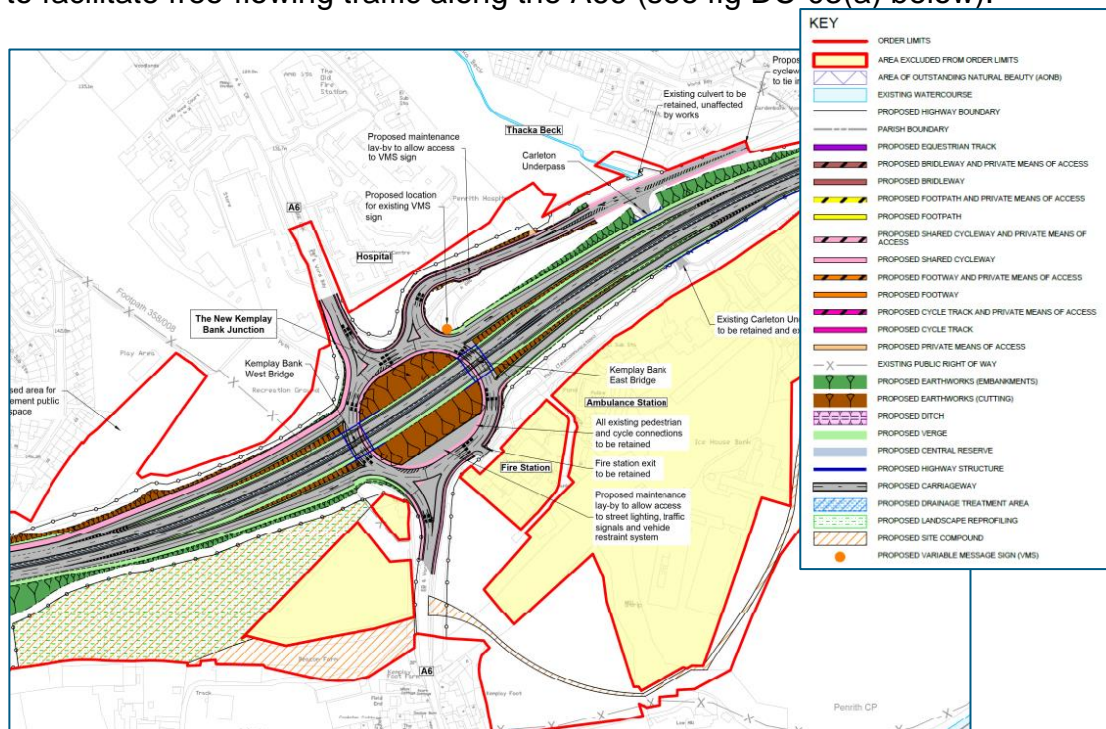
(a) Extract from General Arrangement Drawing (Before)
